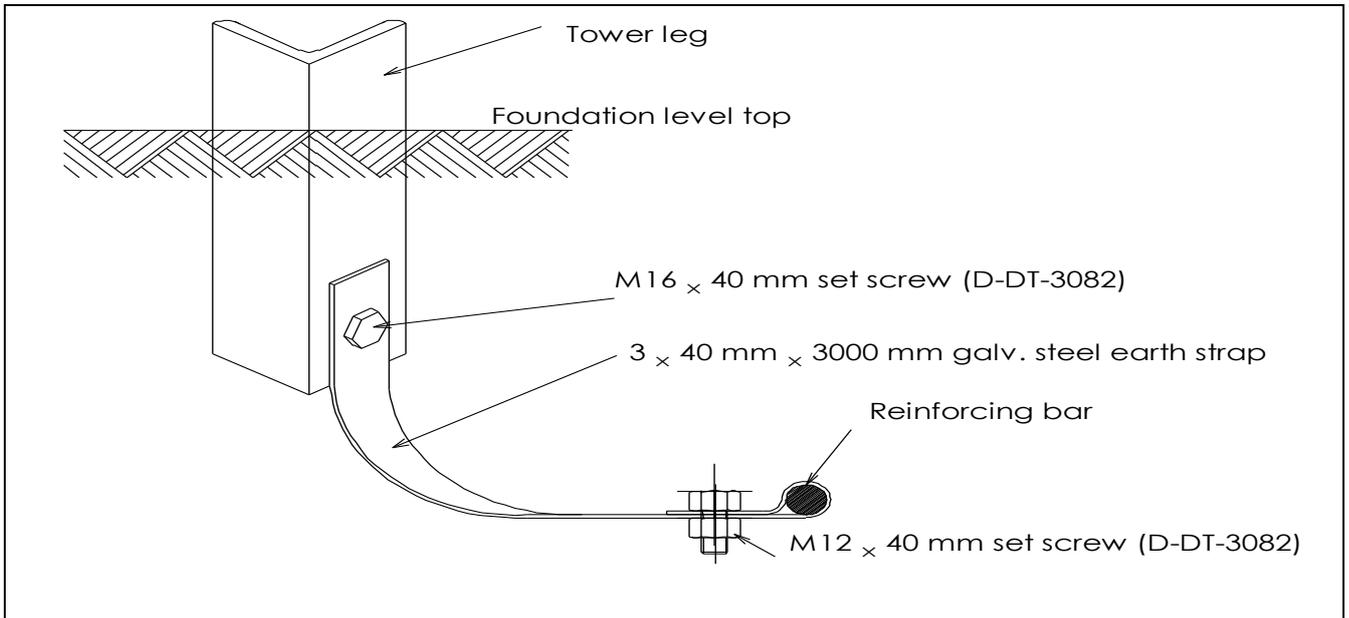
Connection between tower steel and reinforcing bar with largest diameter
